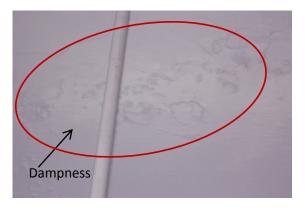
Dampness on Roof of Shop No. 12 & 13, Ground Floor
